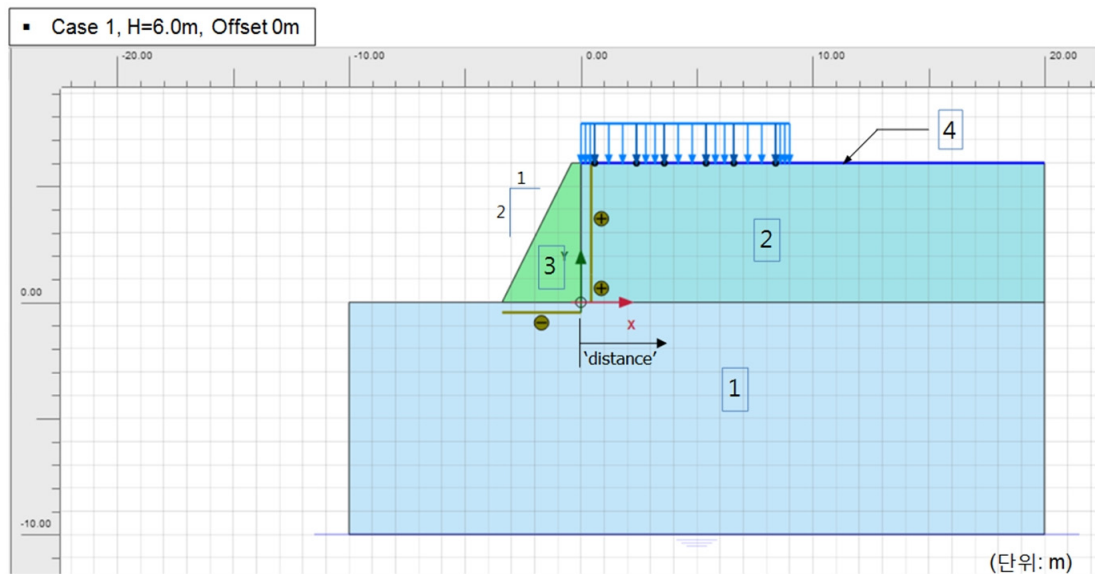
Typical model section (Case 1; height of wall: 6.0 m)
